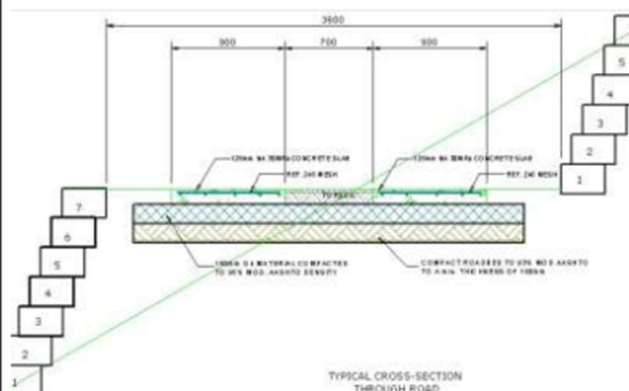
Road construction details from Appendix D12 Civil Services Report
